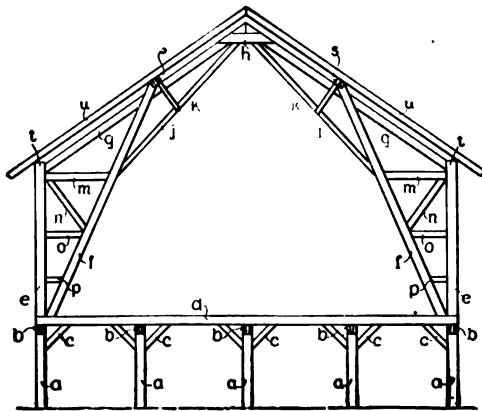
Interior bent of plain gable barn, with basement. Shawver plank-frame construction. a, post of basement; b, girders; c, braces; d, sill of superstructure; e, post; f, purlin post; g, roof support; h, collar beams; j, sub-support; k, stay; m, main tie; n, tie; o, tie; p, tie; s, purlin plate; t, main plate; u, rafter.
